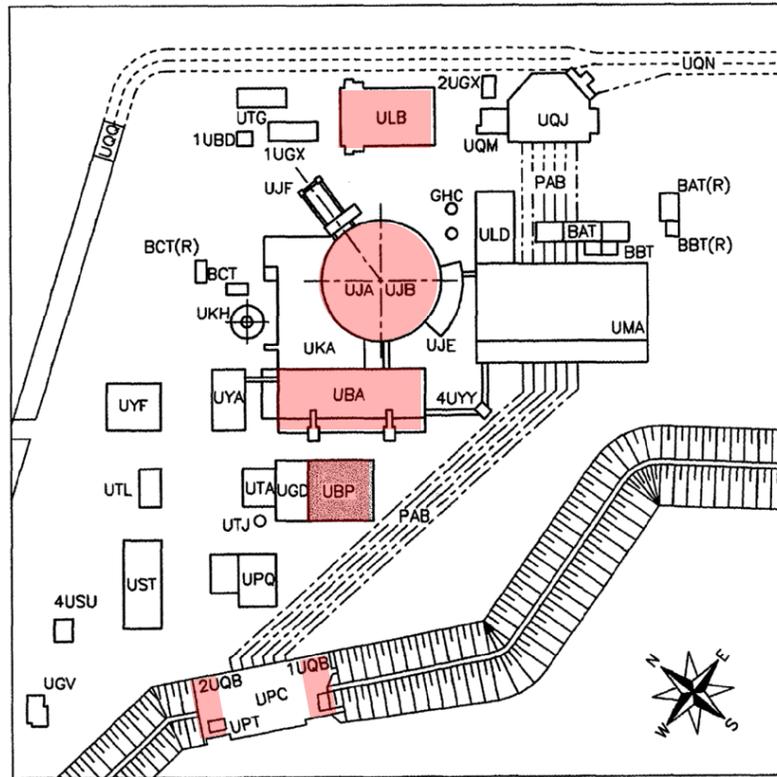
Arrangement of Angra 2 NPP buildings (red areas indicate buildings considered in SPSA)
